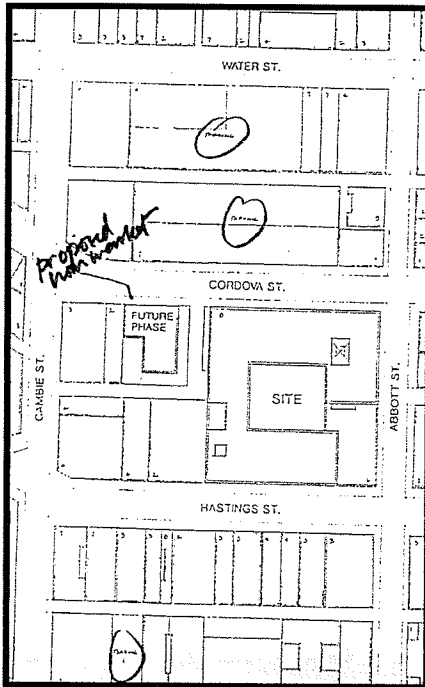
Site Plan compliments of Davidson Yuen and Simpson
